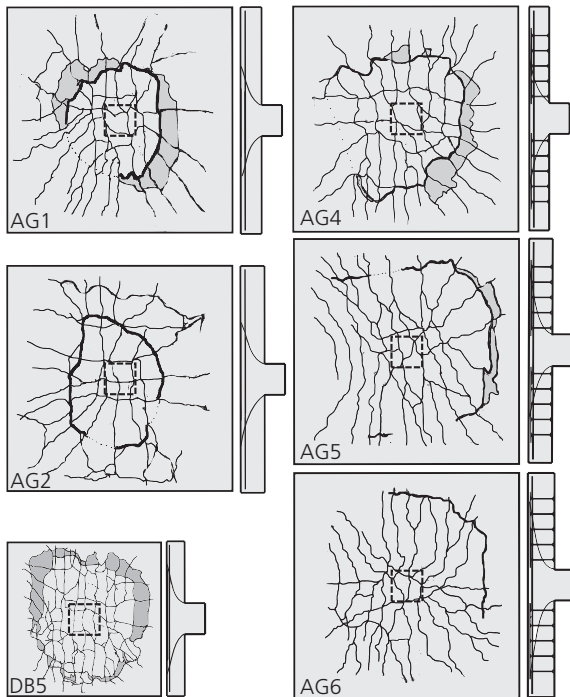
Crack patterns on the top surface and assumed crack patterns in section for the AG specimens
